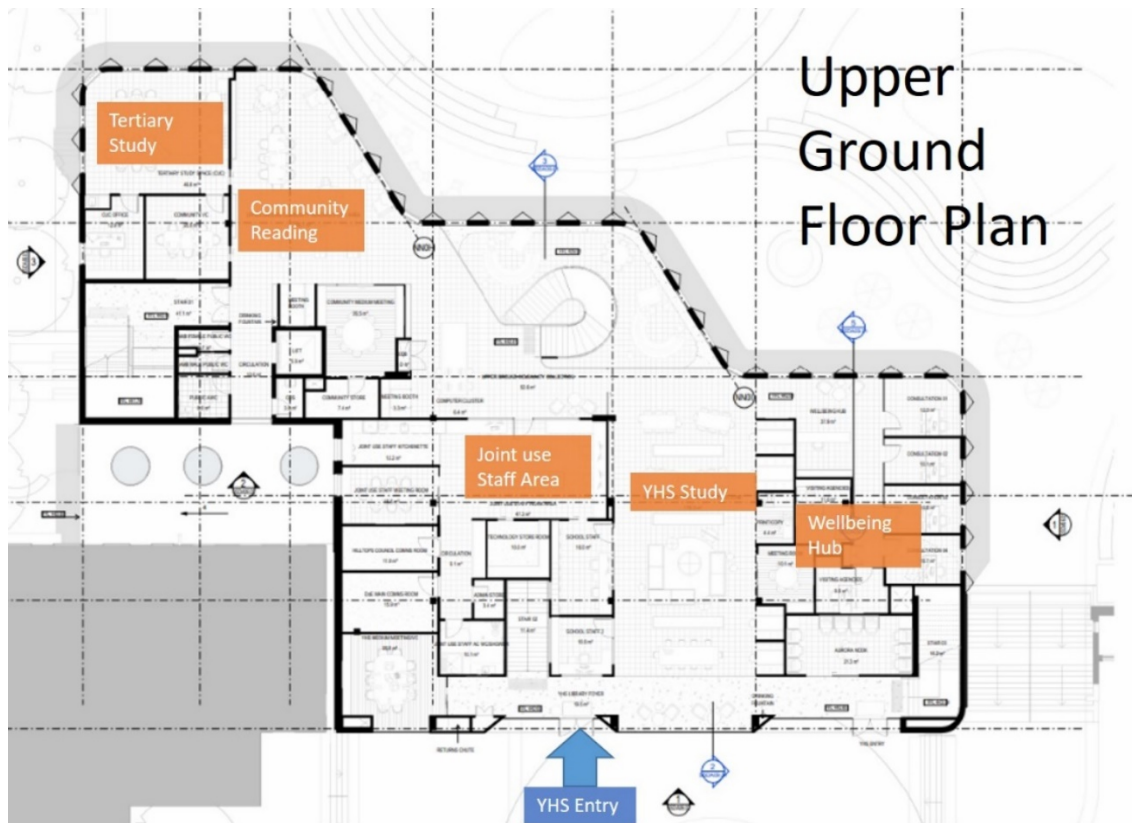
| New Library upper ground floor plan (Source: Applicant's EIS 2019)
